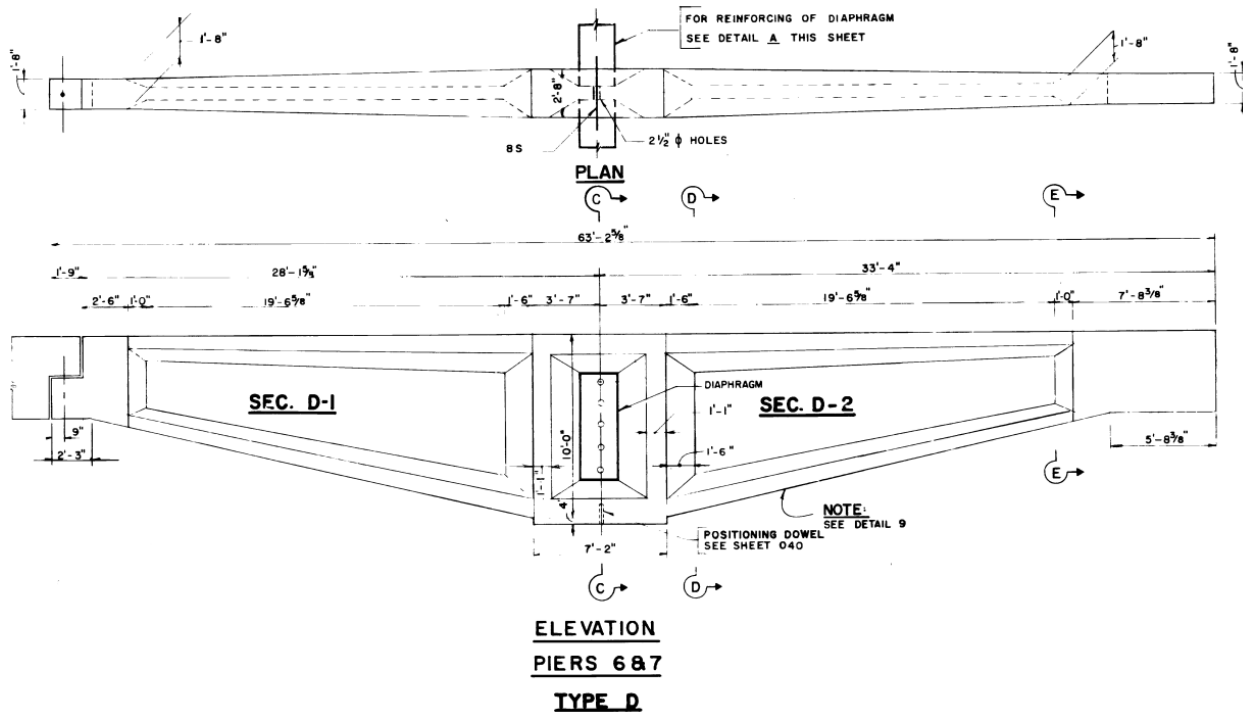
Type D Cantilever Beam at Pier 6 & 7 (Sheet 74, Cantilevers Sheet 1 of original plans, 1967).
